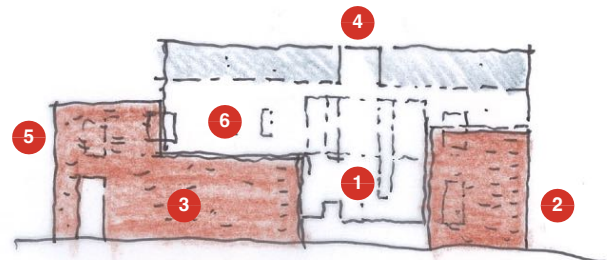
Nimrod Street. New theatre building including new passenger lift (1), access stairs (2) fire egress stairs (3), smoke exhaust (4), air conditioning plant (5) and Stables narrative (6).
